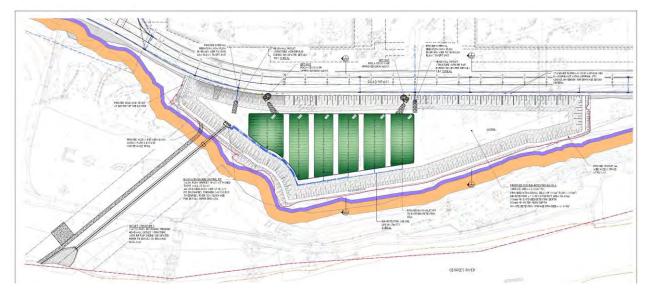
Basin 6 Layout Plan (Source: Costin Roe Consulting SDDR 2019)
